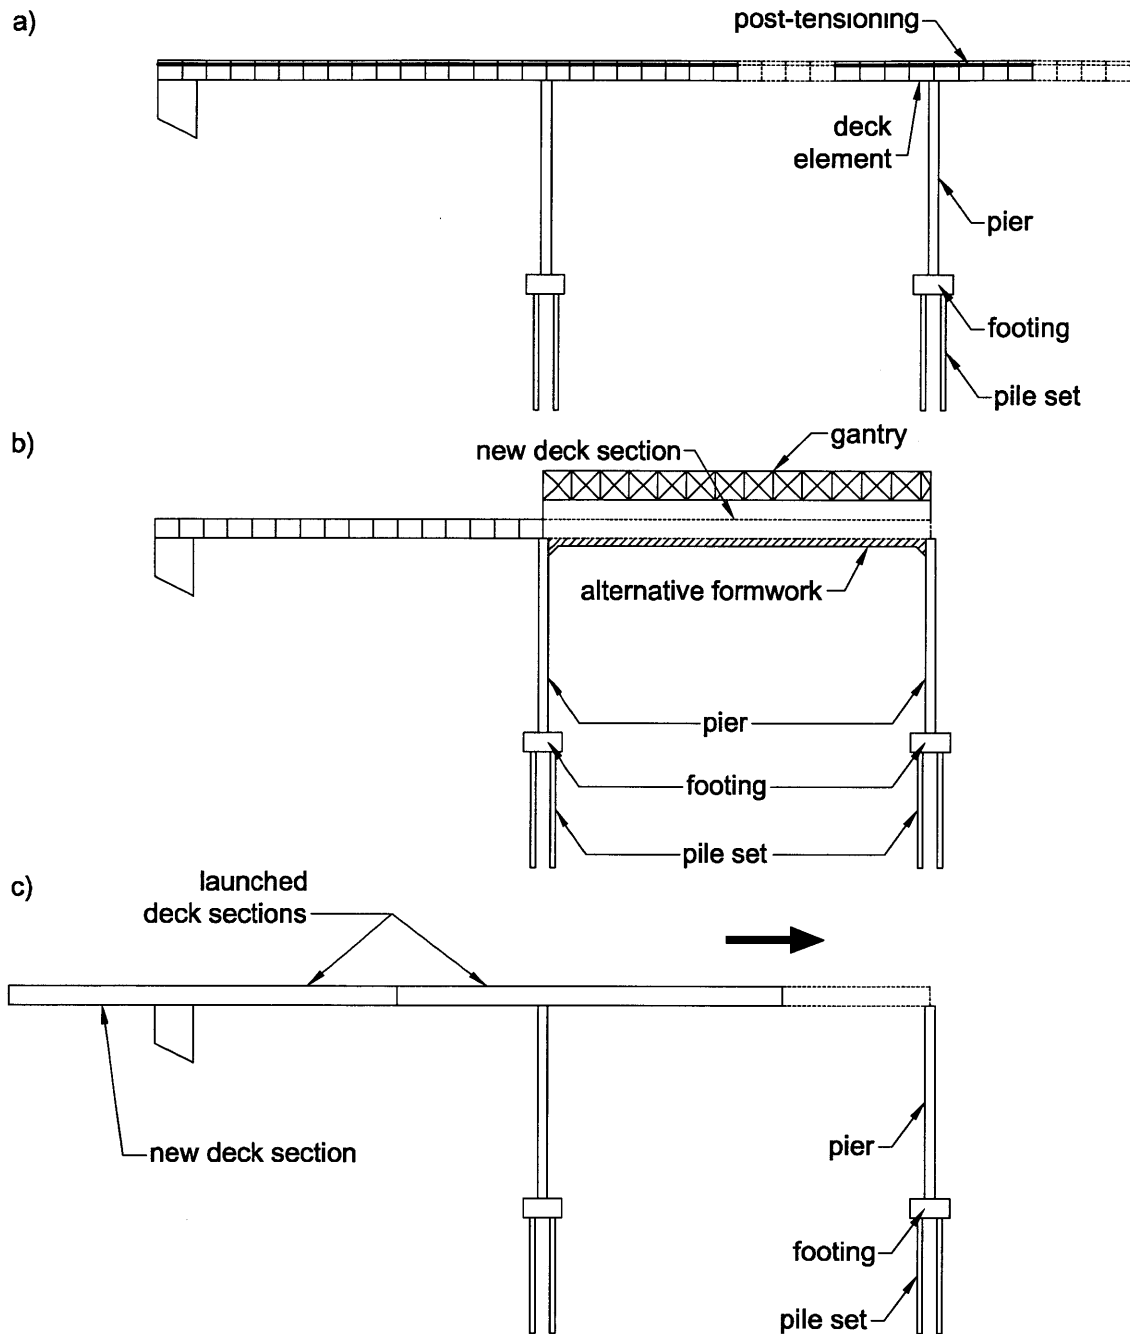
a) construction of a viaduct with the balanced cantilever method: the deck section is built after the pile set, the footings and the pier are constructed. b) construction of a viaduct with the span-by-span method: the deck section is built after the preceding and following pile sets, footing and piers are constructed. c) construction of a viaduct with the launching method: similarly to the span-by-span construction method, the deck section is built (launched) after the preceding and following pile sets, footings and piers are constructed.
